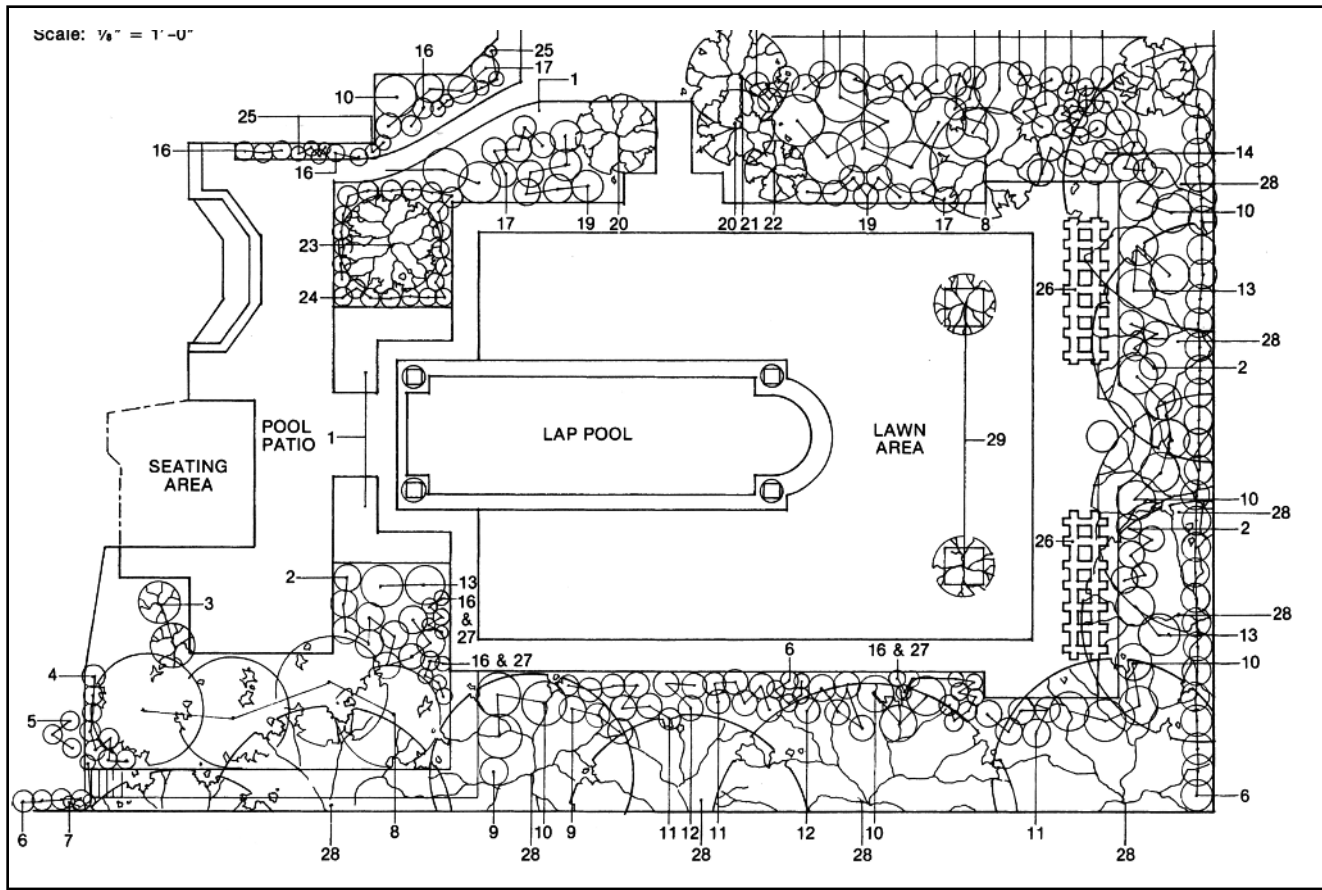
Planting Plan. The planting plan provides information about plant types and locations in the landscape. Understanding each plant's characteristics, as well as, the integration of each individual into the overall landscape design, helps the lighting designer develop a lighting concept. Landscape Design: Magrane Latker Landscape Design; Drawing: Lezlie Johannessen.
